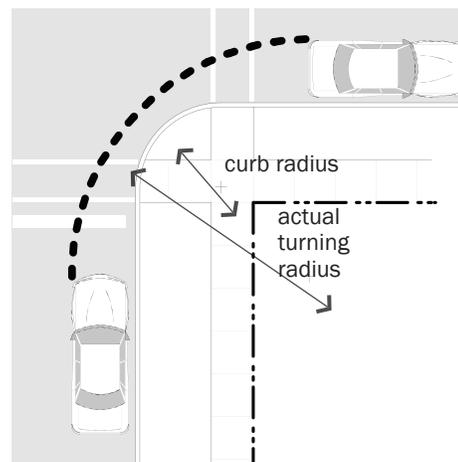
(1). Actual Curb Turn Radius with On-Street Parking.
